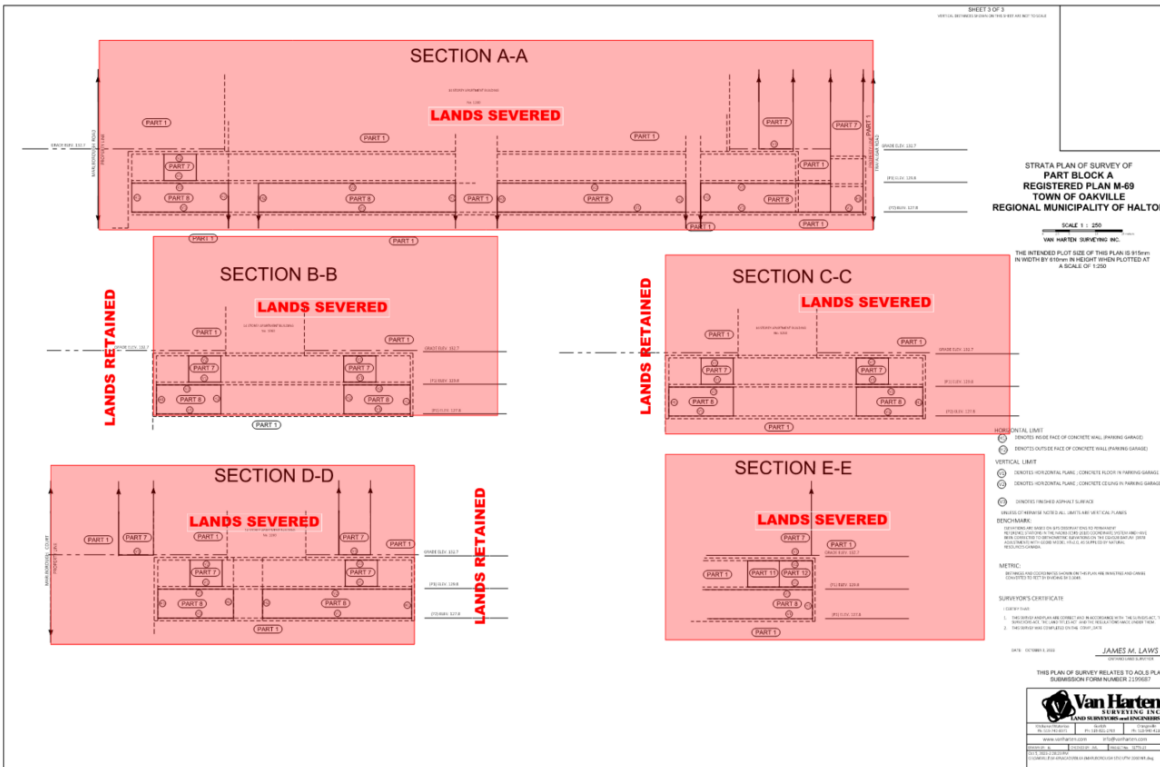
Strata Plan of Survey (Sheet 2 of 3)
